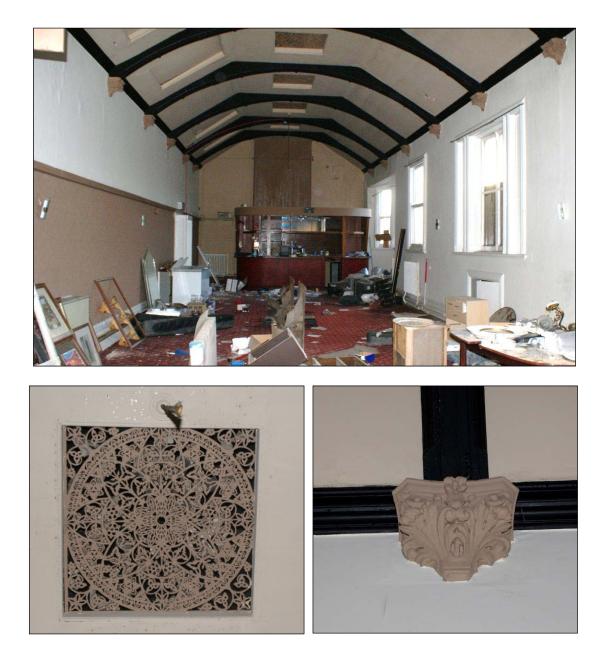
The first floor function room of the west range, looking south (top); the decorative grilles (left) and stone corbels (right)
